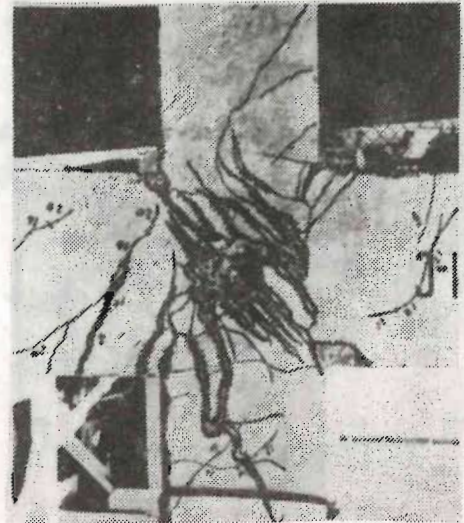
Compression failure of a beam-column joint without hinges under skew-symmetric loading (Vasiliev, et al, U.S.S.R.)
